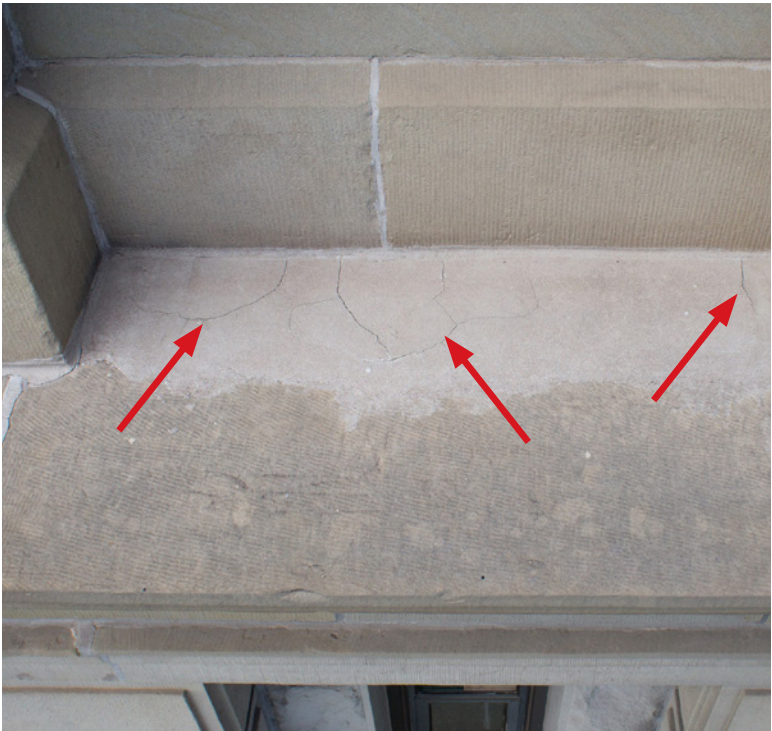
Cracked Patch Repair at the Cornice Below a Window at the South Elevation.
